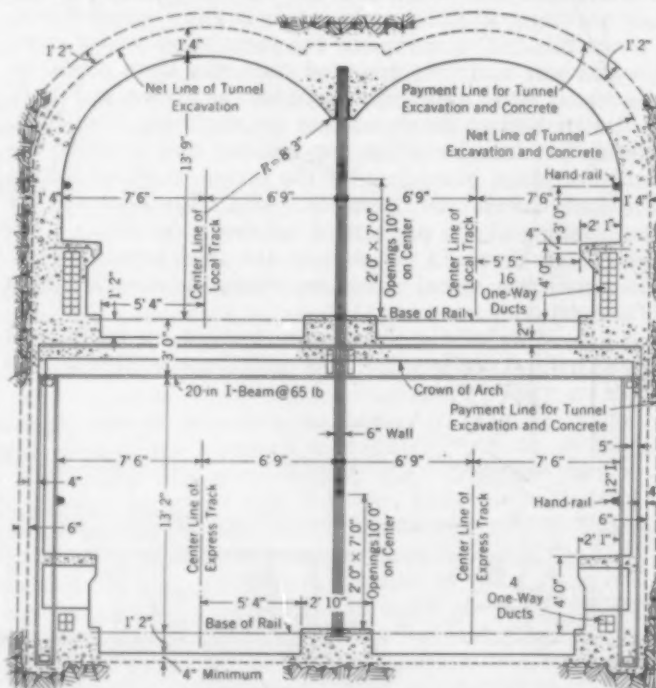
DOUBLE-DECKED TUNNEL AT 157TH STREET On the St. Nicholas Avenue Line
